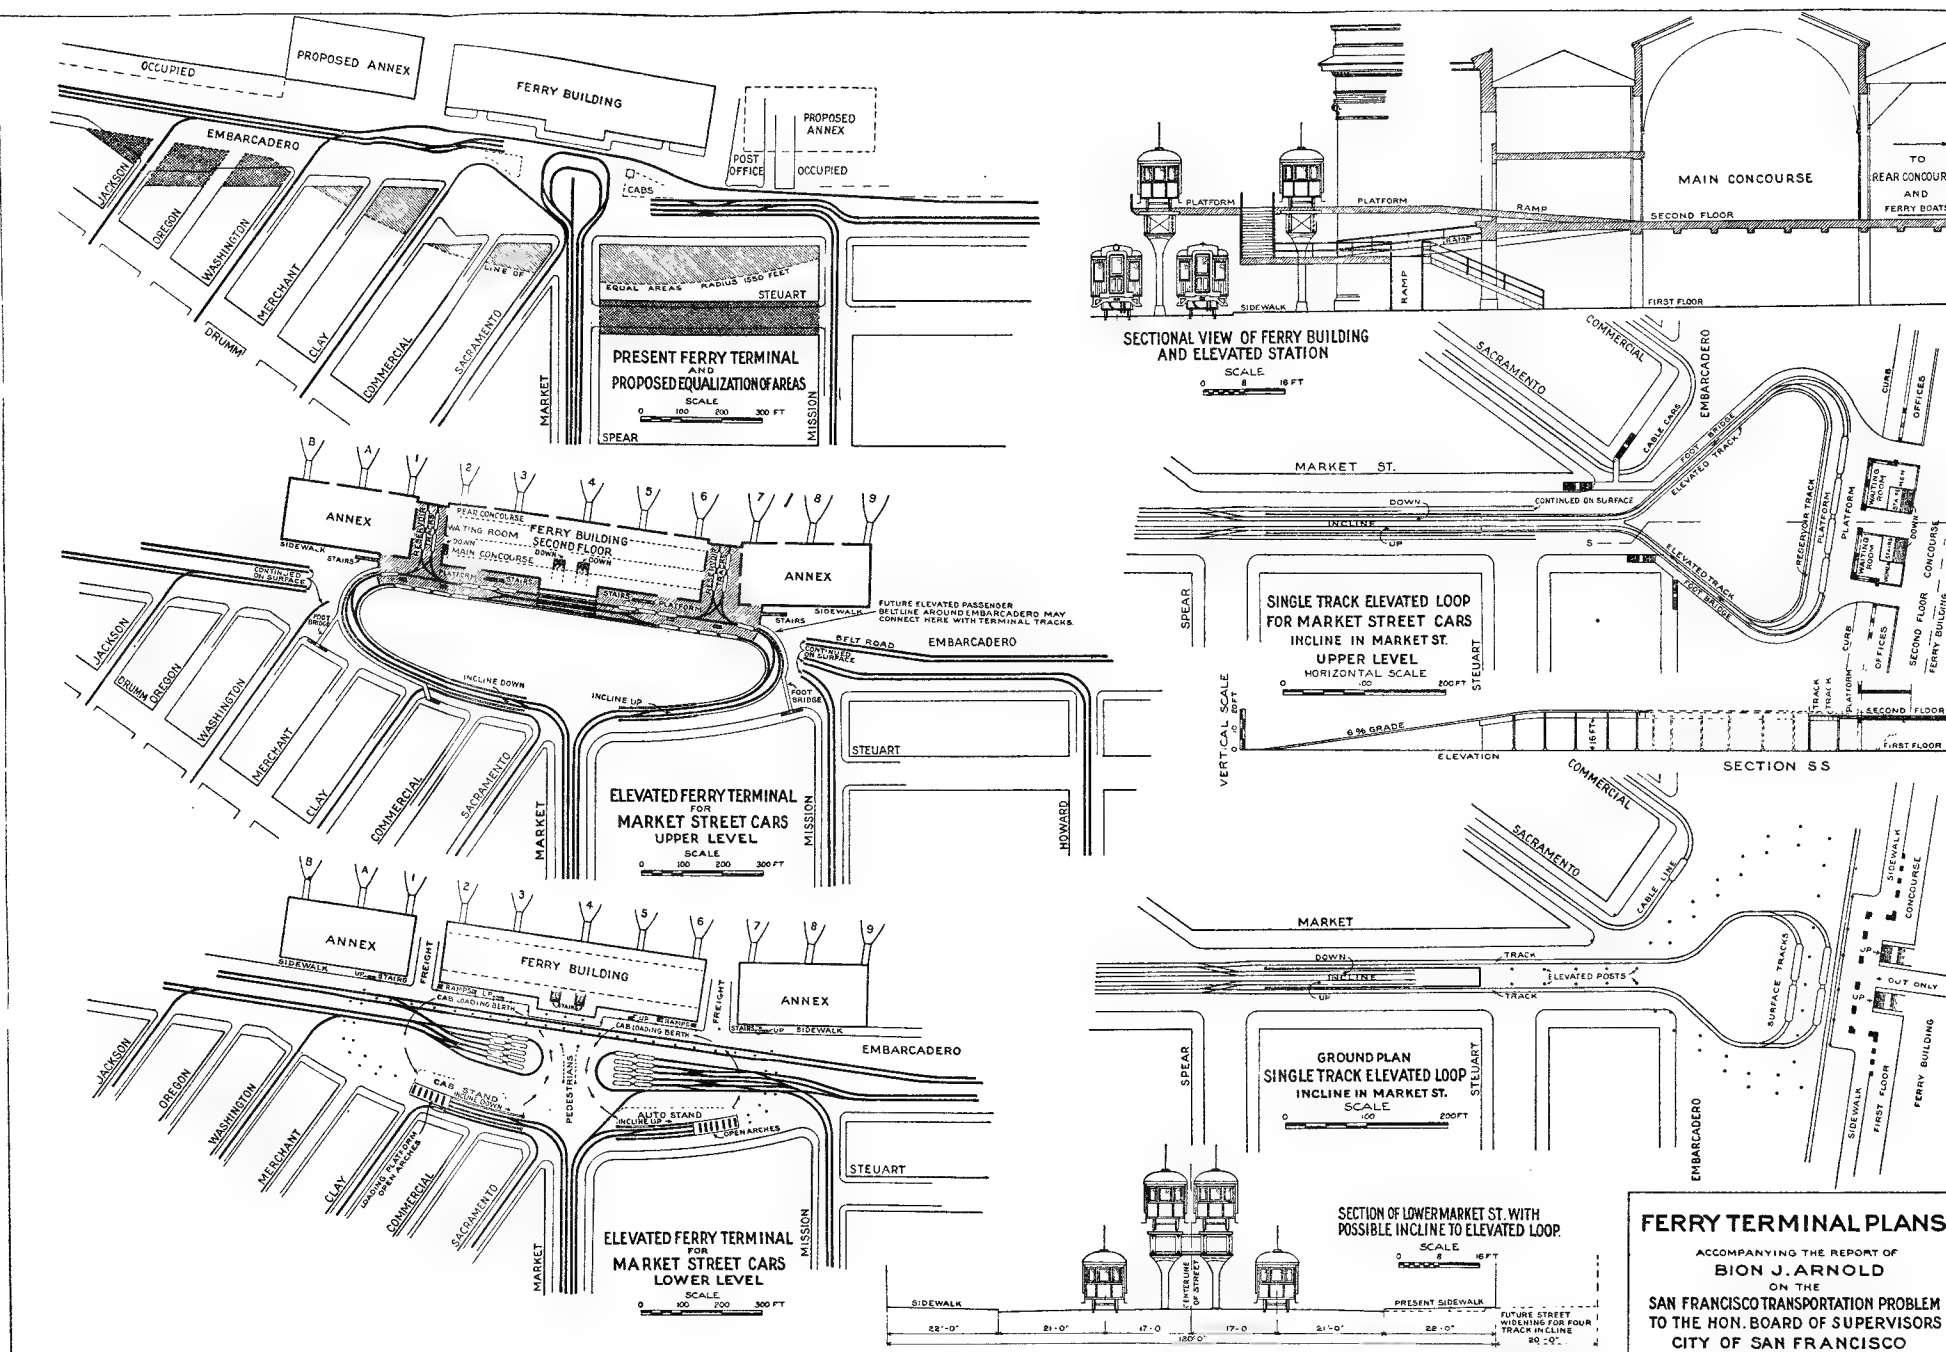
FERRY TERMINAL IMPROVEMENT PLANS.
